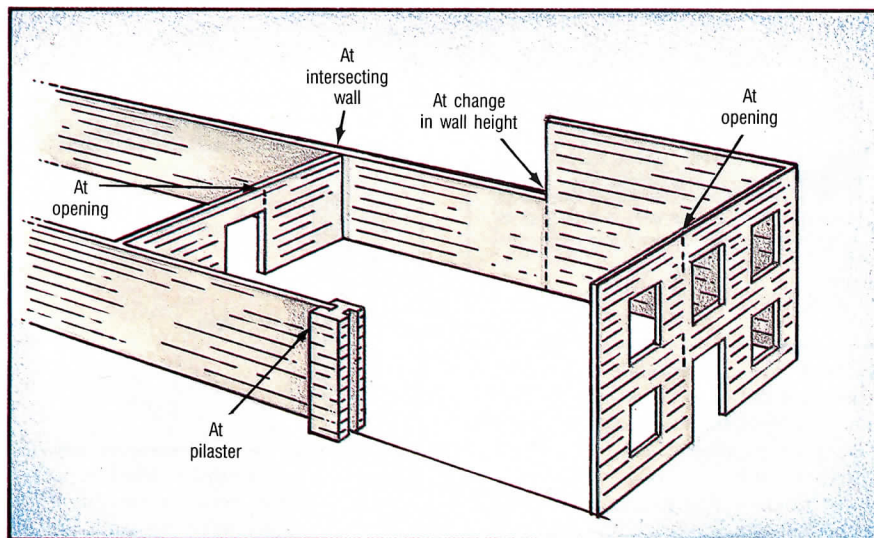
Control joints should be constructed in concrete masonry at openings, pilasters, wall intersections, and changes in wall cross-section. They also should be spaced to form approximately square panels.
